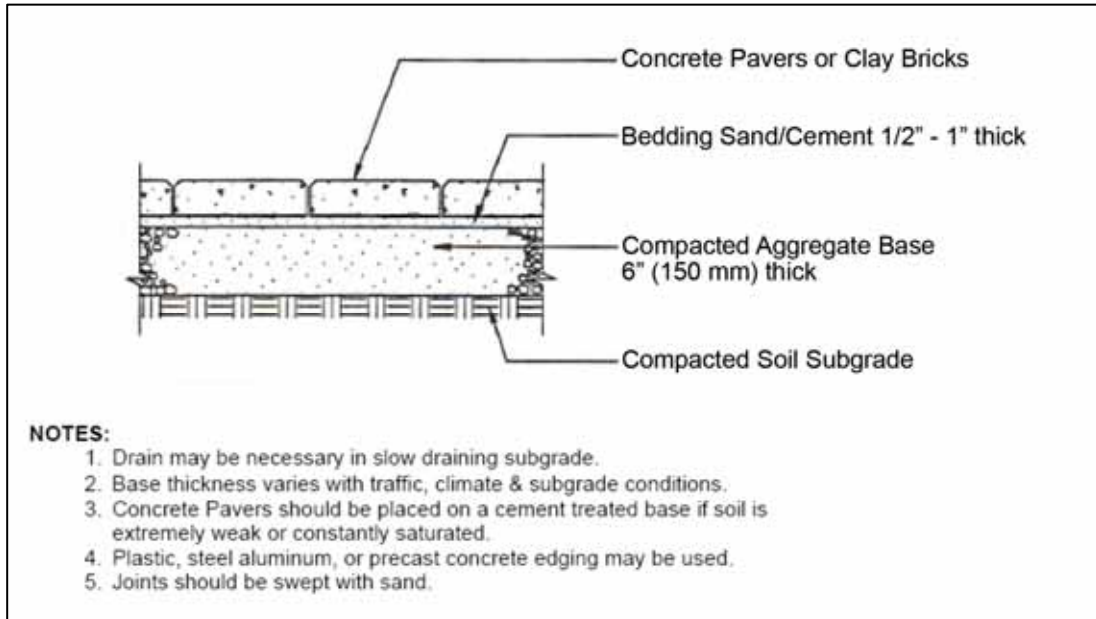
Concrete Pedestrian Pavers Installation – Sand Set over Aggregate Base
